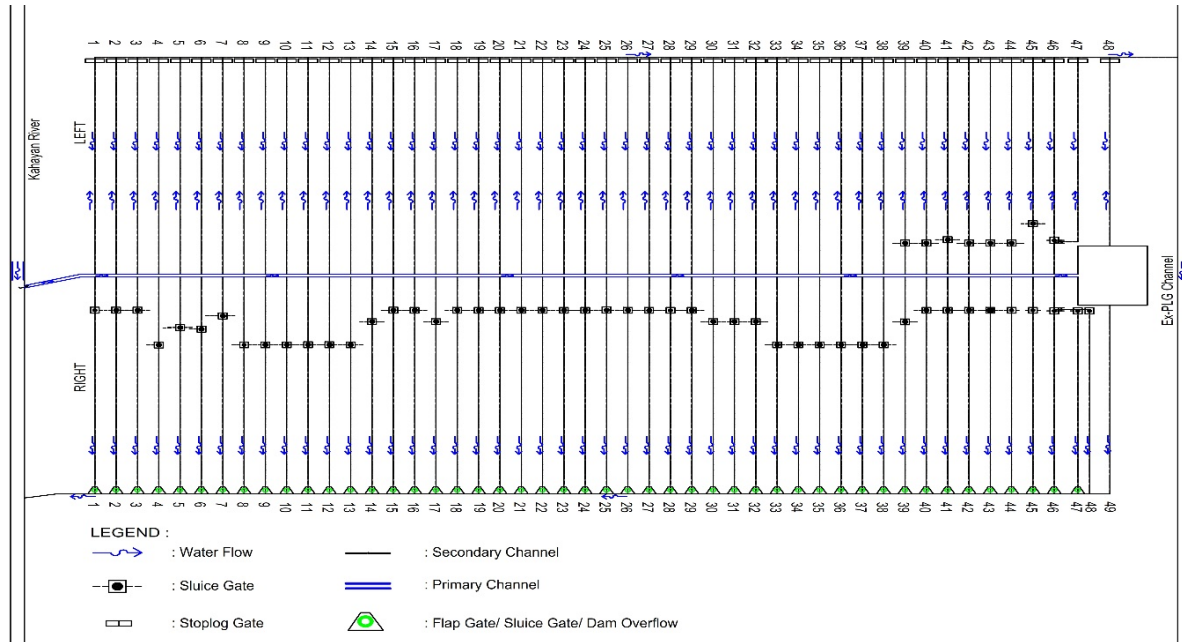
Schematic development plan of DIR (*Daerah Irigasi Rawa*) Tahai.
